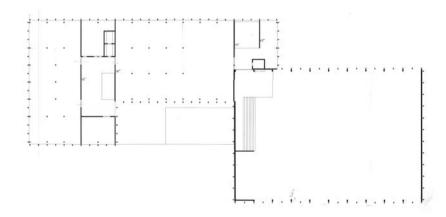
Loadbearing structure, ground floor, 1:1000 Plans of design process with additions by hand
